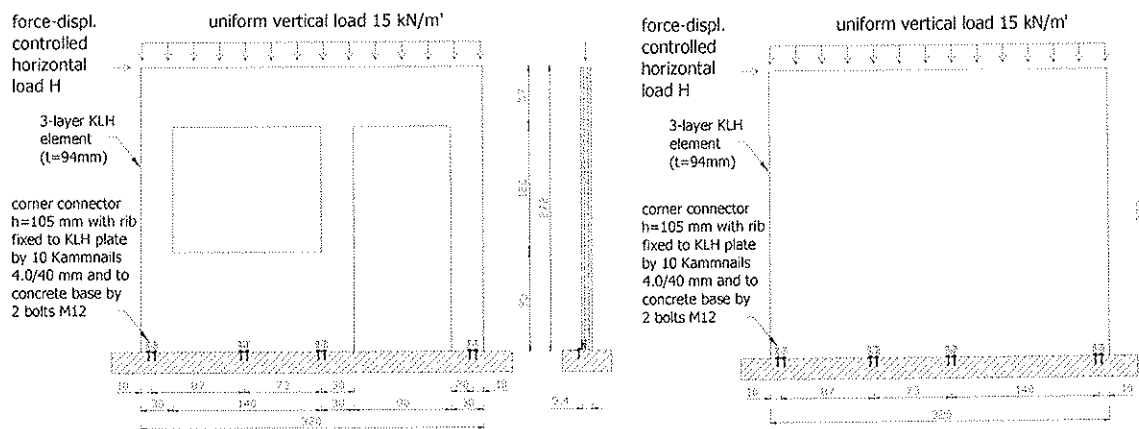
Configuration of Wall 13 with a door and a window openings and Wall 14 without openings.
